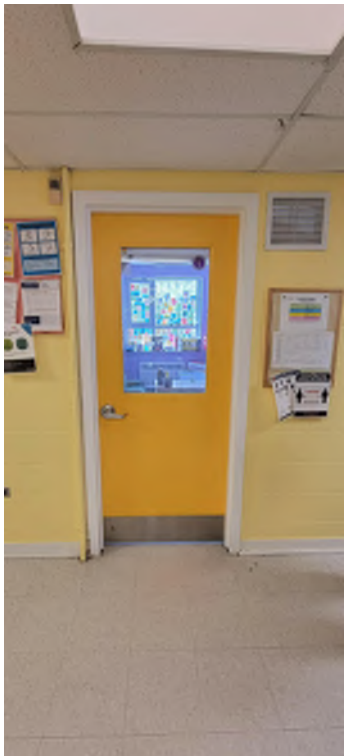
CORRIDOR TO TODDLER'S ROOM
